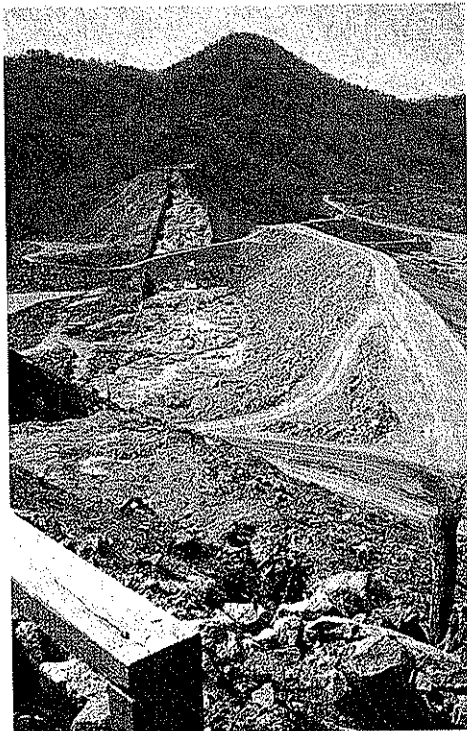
Kinda project. Photograph showing the cofferdam with its downstream slope 1V:1.3H and the core trench excavation in 1982 (courtesy of LI).
